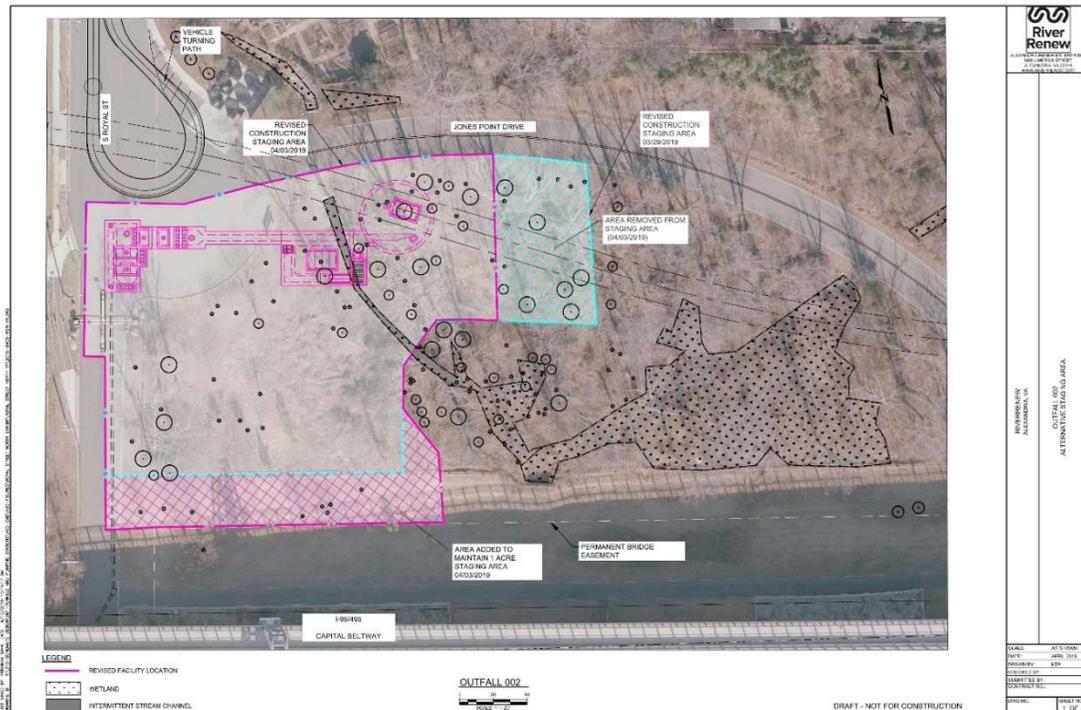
Outfall 002 Diversion Facility – Royal Street North Option
